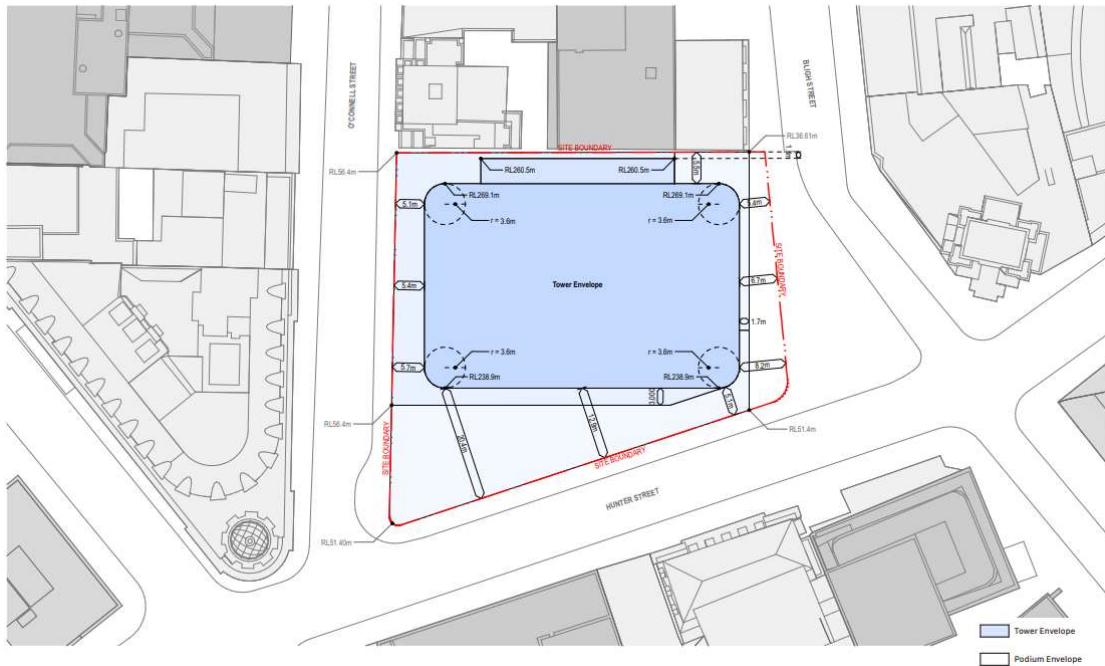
Plan showing Hunter Street East planning envelope. Source: FJMT Studio, 2021.
